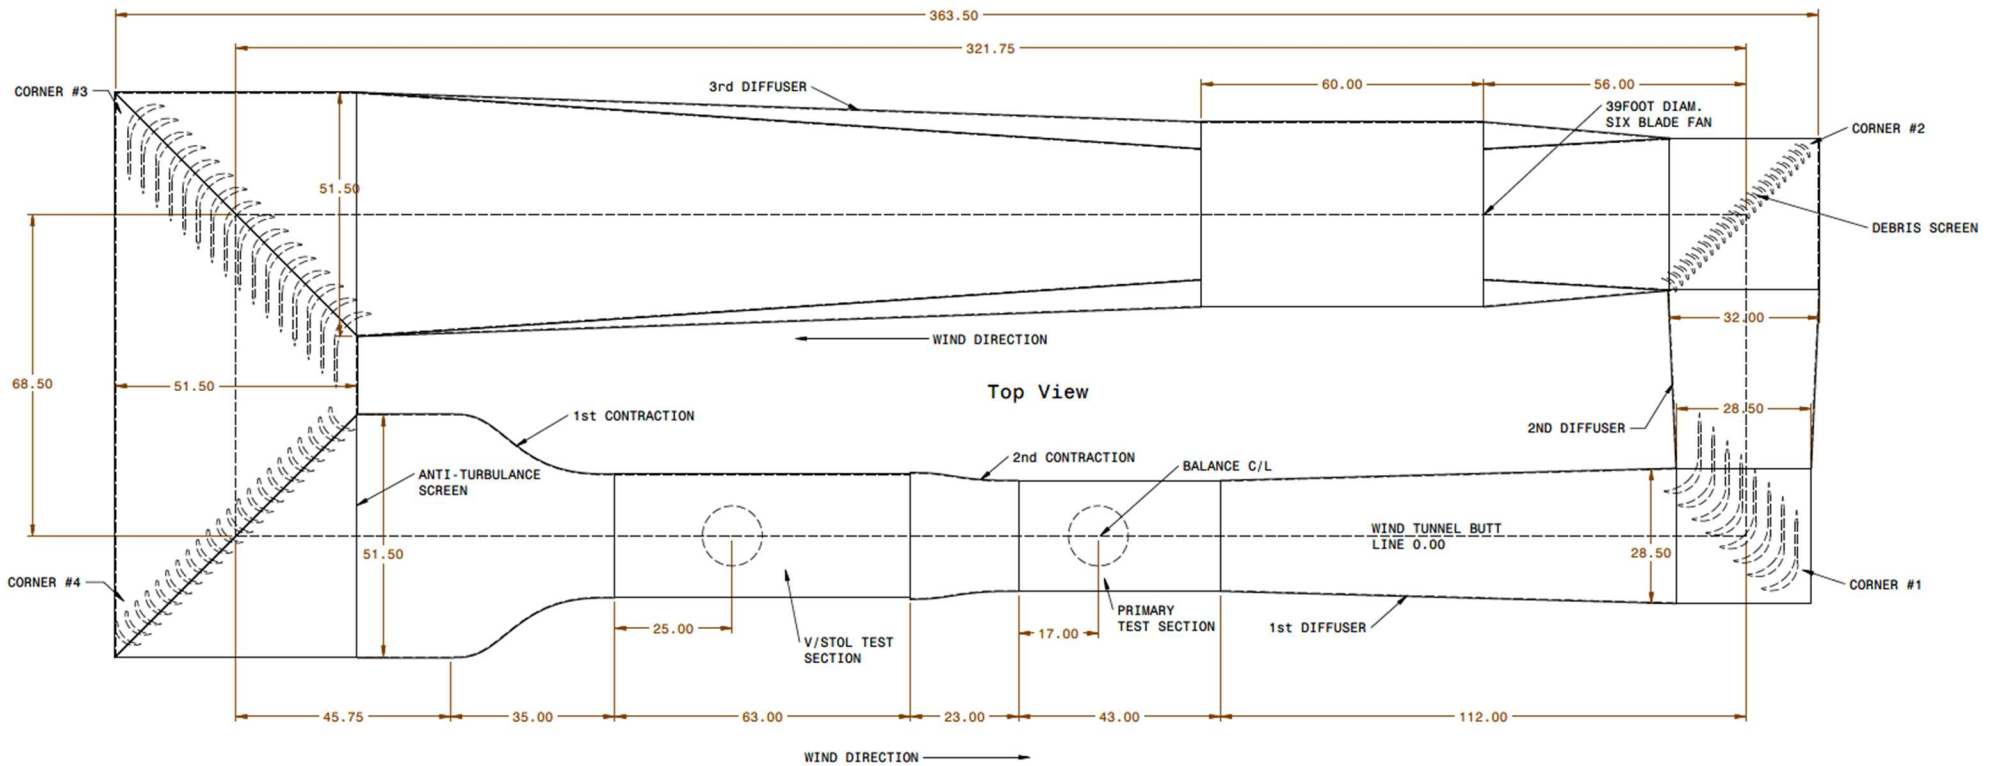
General Arrangement of the Low Speed Wind Tunnel.
